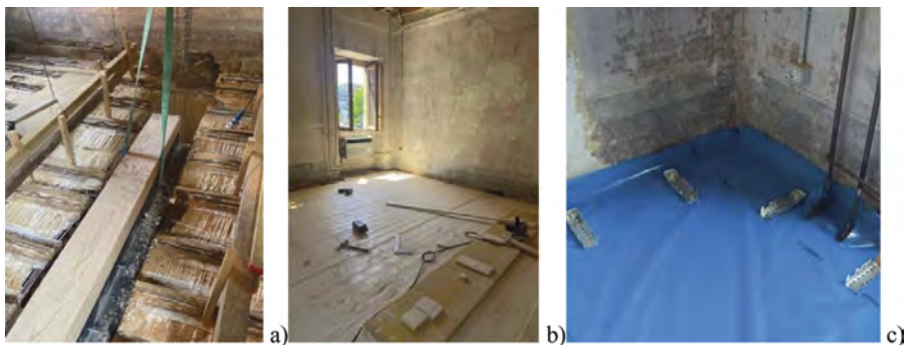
Room 33 seismic improvement actions (a) main beam replacement; (b) cross deck placement; (c) floor-wall connections with inclined drills.
